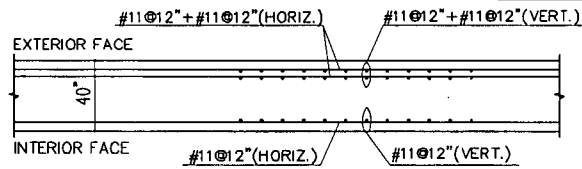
Typical Reinforcement in North Exterior Wall of Spent Fuel Pit – SECTION 3
